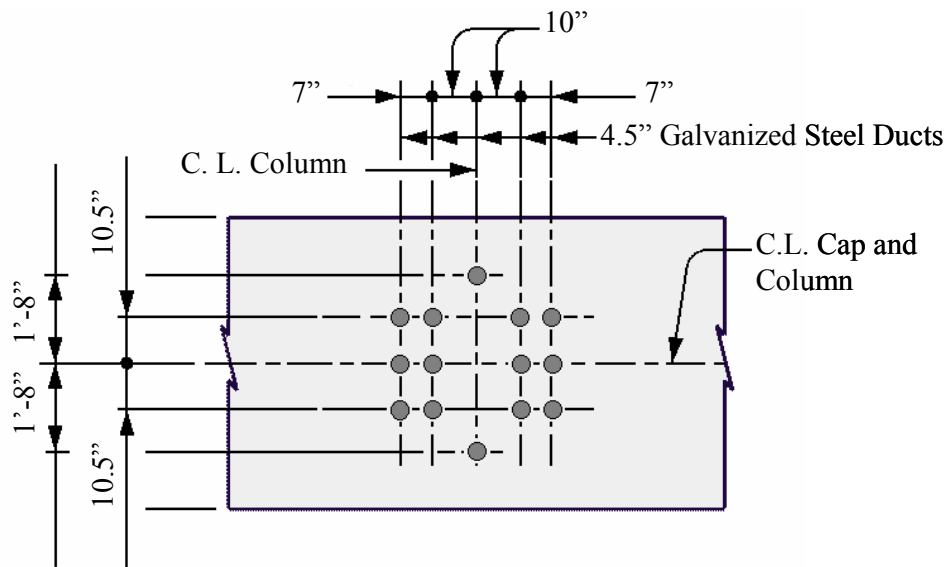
Bent Cap Connection Zone Detail [2.9]
